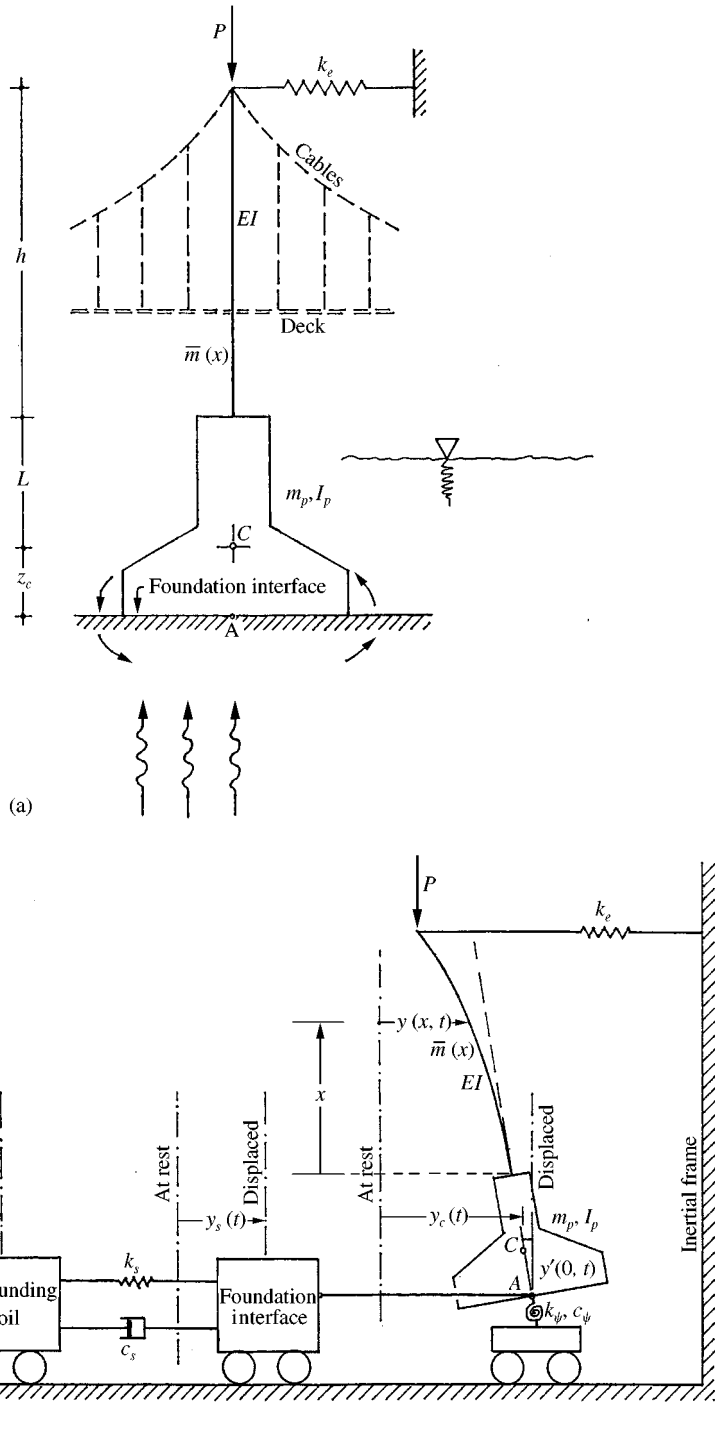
(a) The suspension bridge tower-pier system. (b) The structural model.
